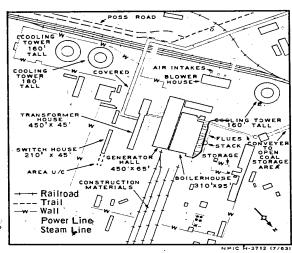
LAYOUT OF THERMAL POWER PLANT NO 1.
